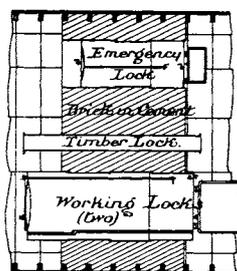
BLACKWALL TUNNEL, LONDON. Bulkhead in Tunnel.
